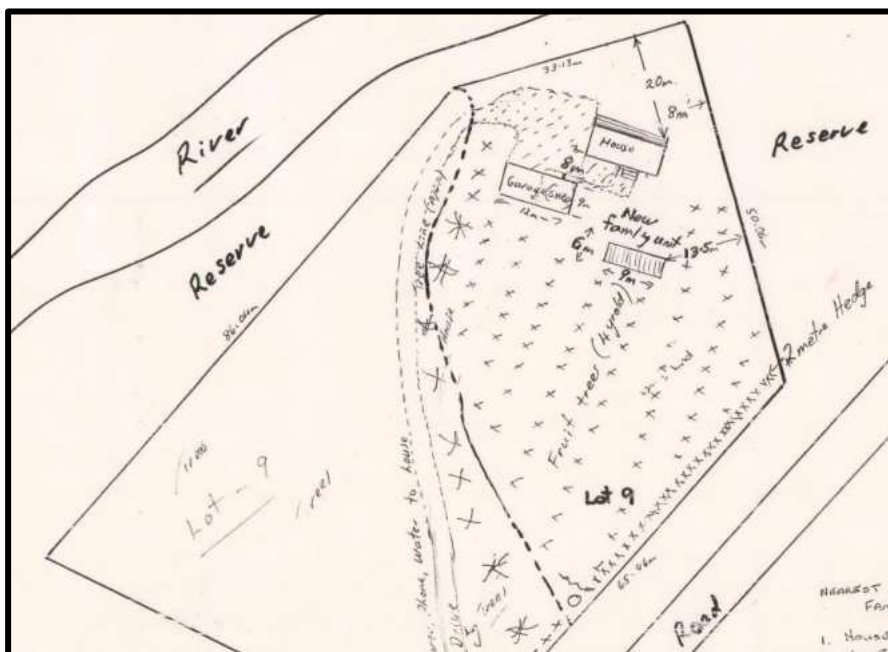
RC1980137 Approved Plan showing location of existing dwelling and proposed family flat.
